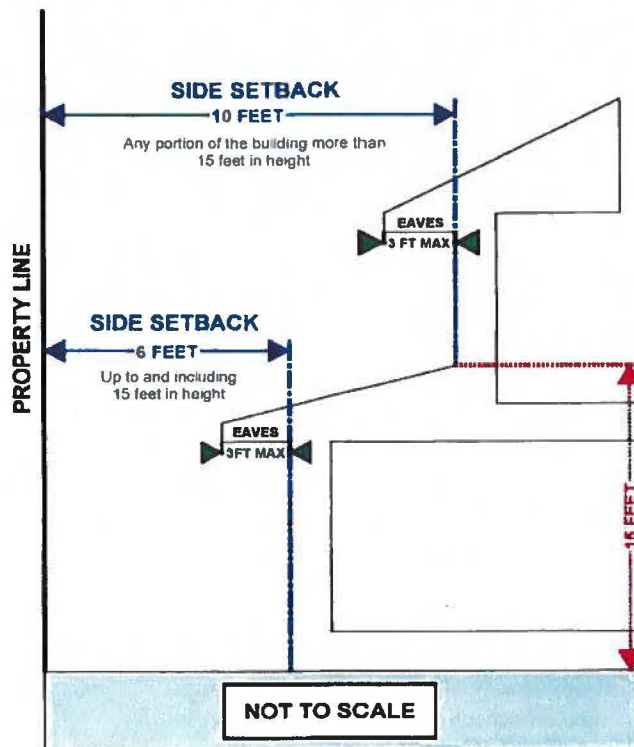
Example of rear and side setback areas for single-family dwelling >15 feet in height (not to scale)
